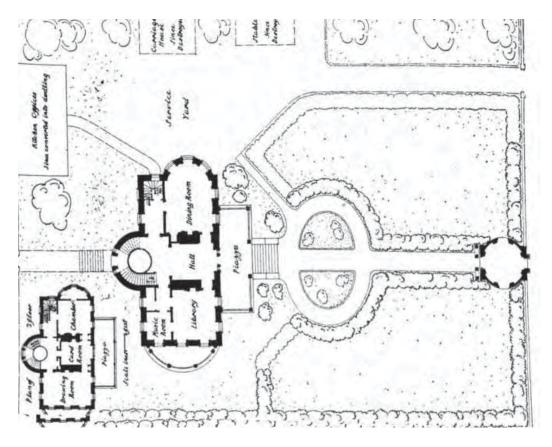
Plan View, Joseph Manigault House, HABS SC 67-5 (194?)
